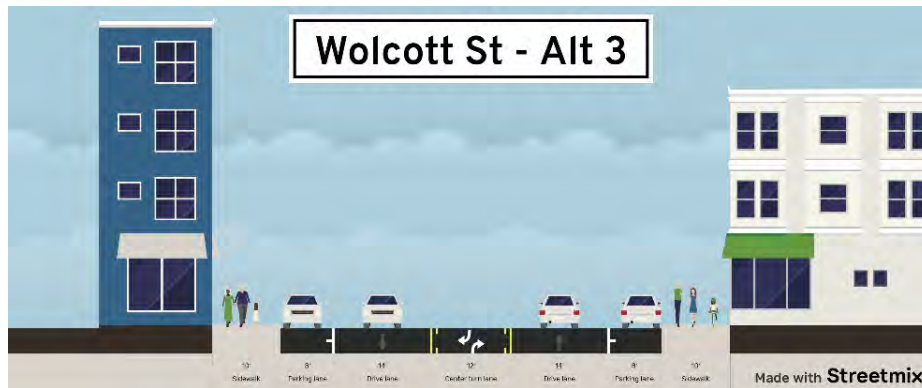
WOLCOTT ST ALTERNATIVE 3 PROPOSED CROSS SECTION
